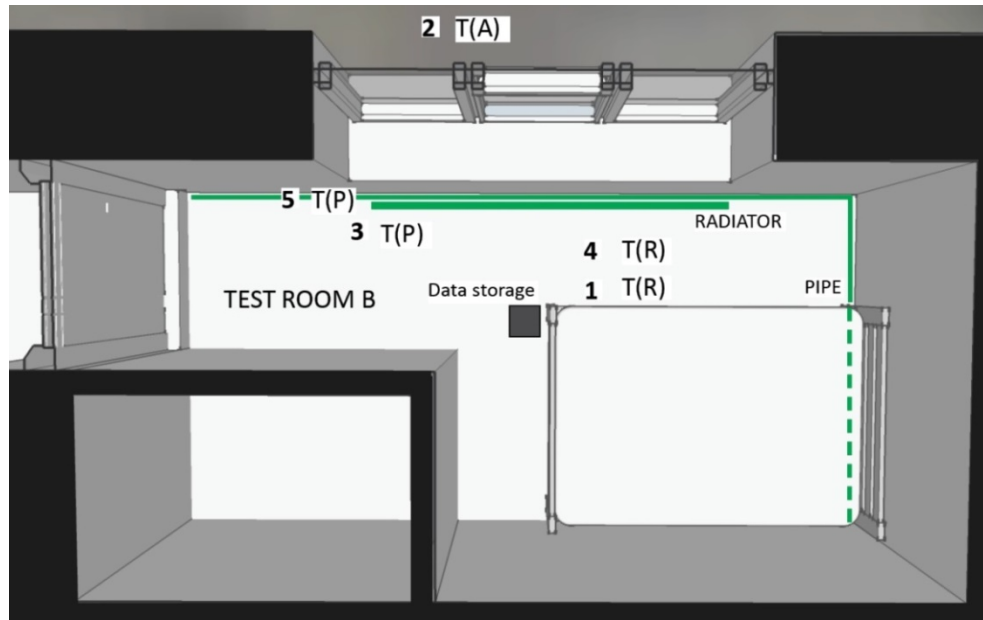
Test room arrangement for Test Week 1 showing thermometer locations
